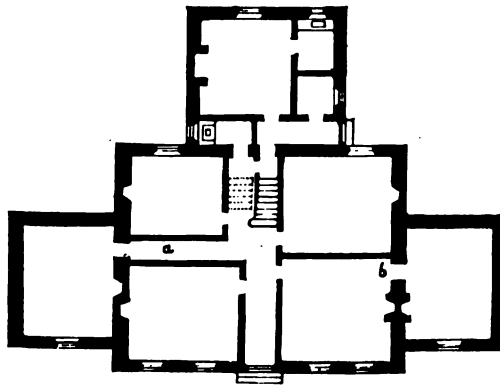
HOUSE WITH SYMMETRICAL WINGS.
